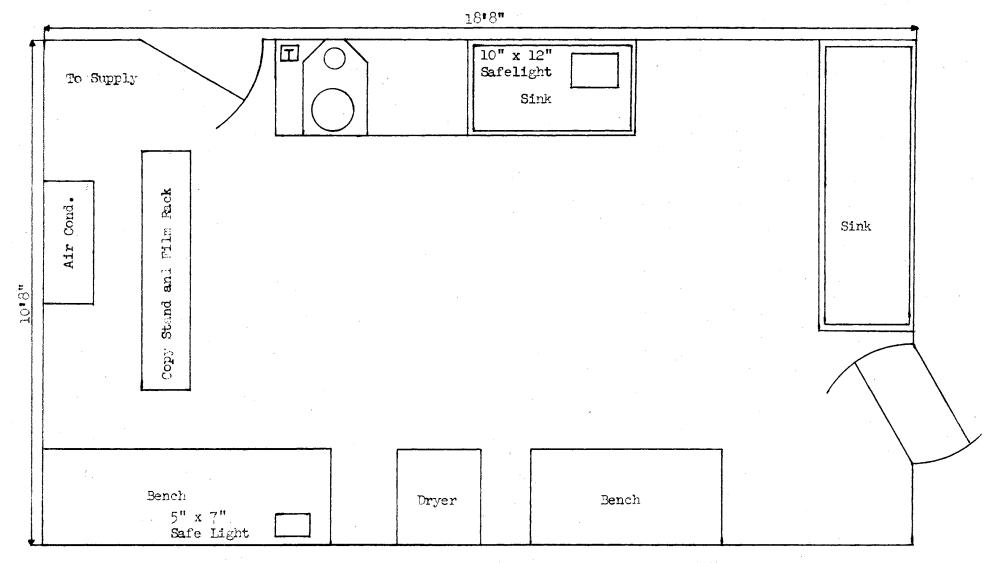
DARKROOM FLOOR PLAN - DAILY ARDMOREITE. (SCALE 1/2" = 1')
